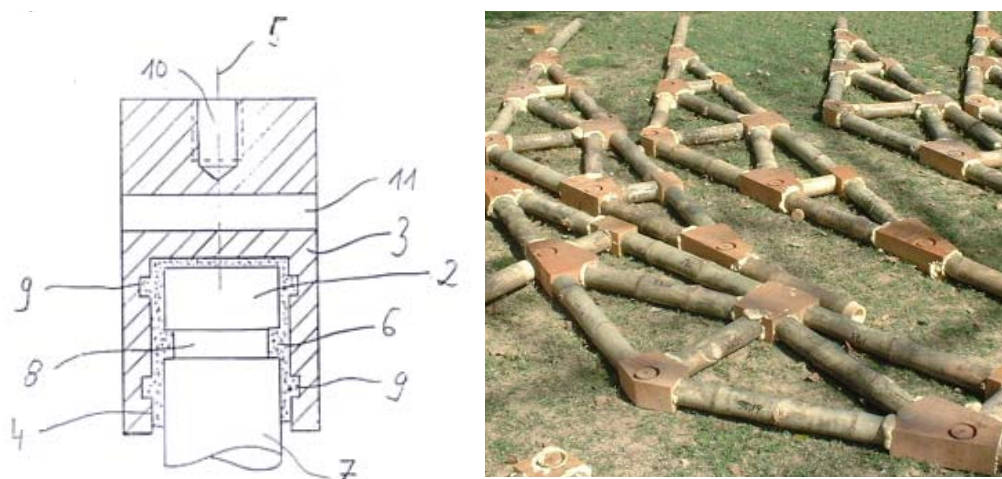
35 The bamboo connection and the roof construction designed by Bambu-Tech (ref. Bambu-Tech)
